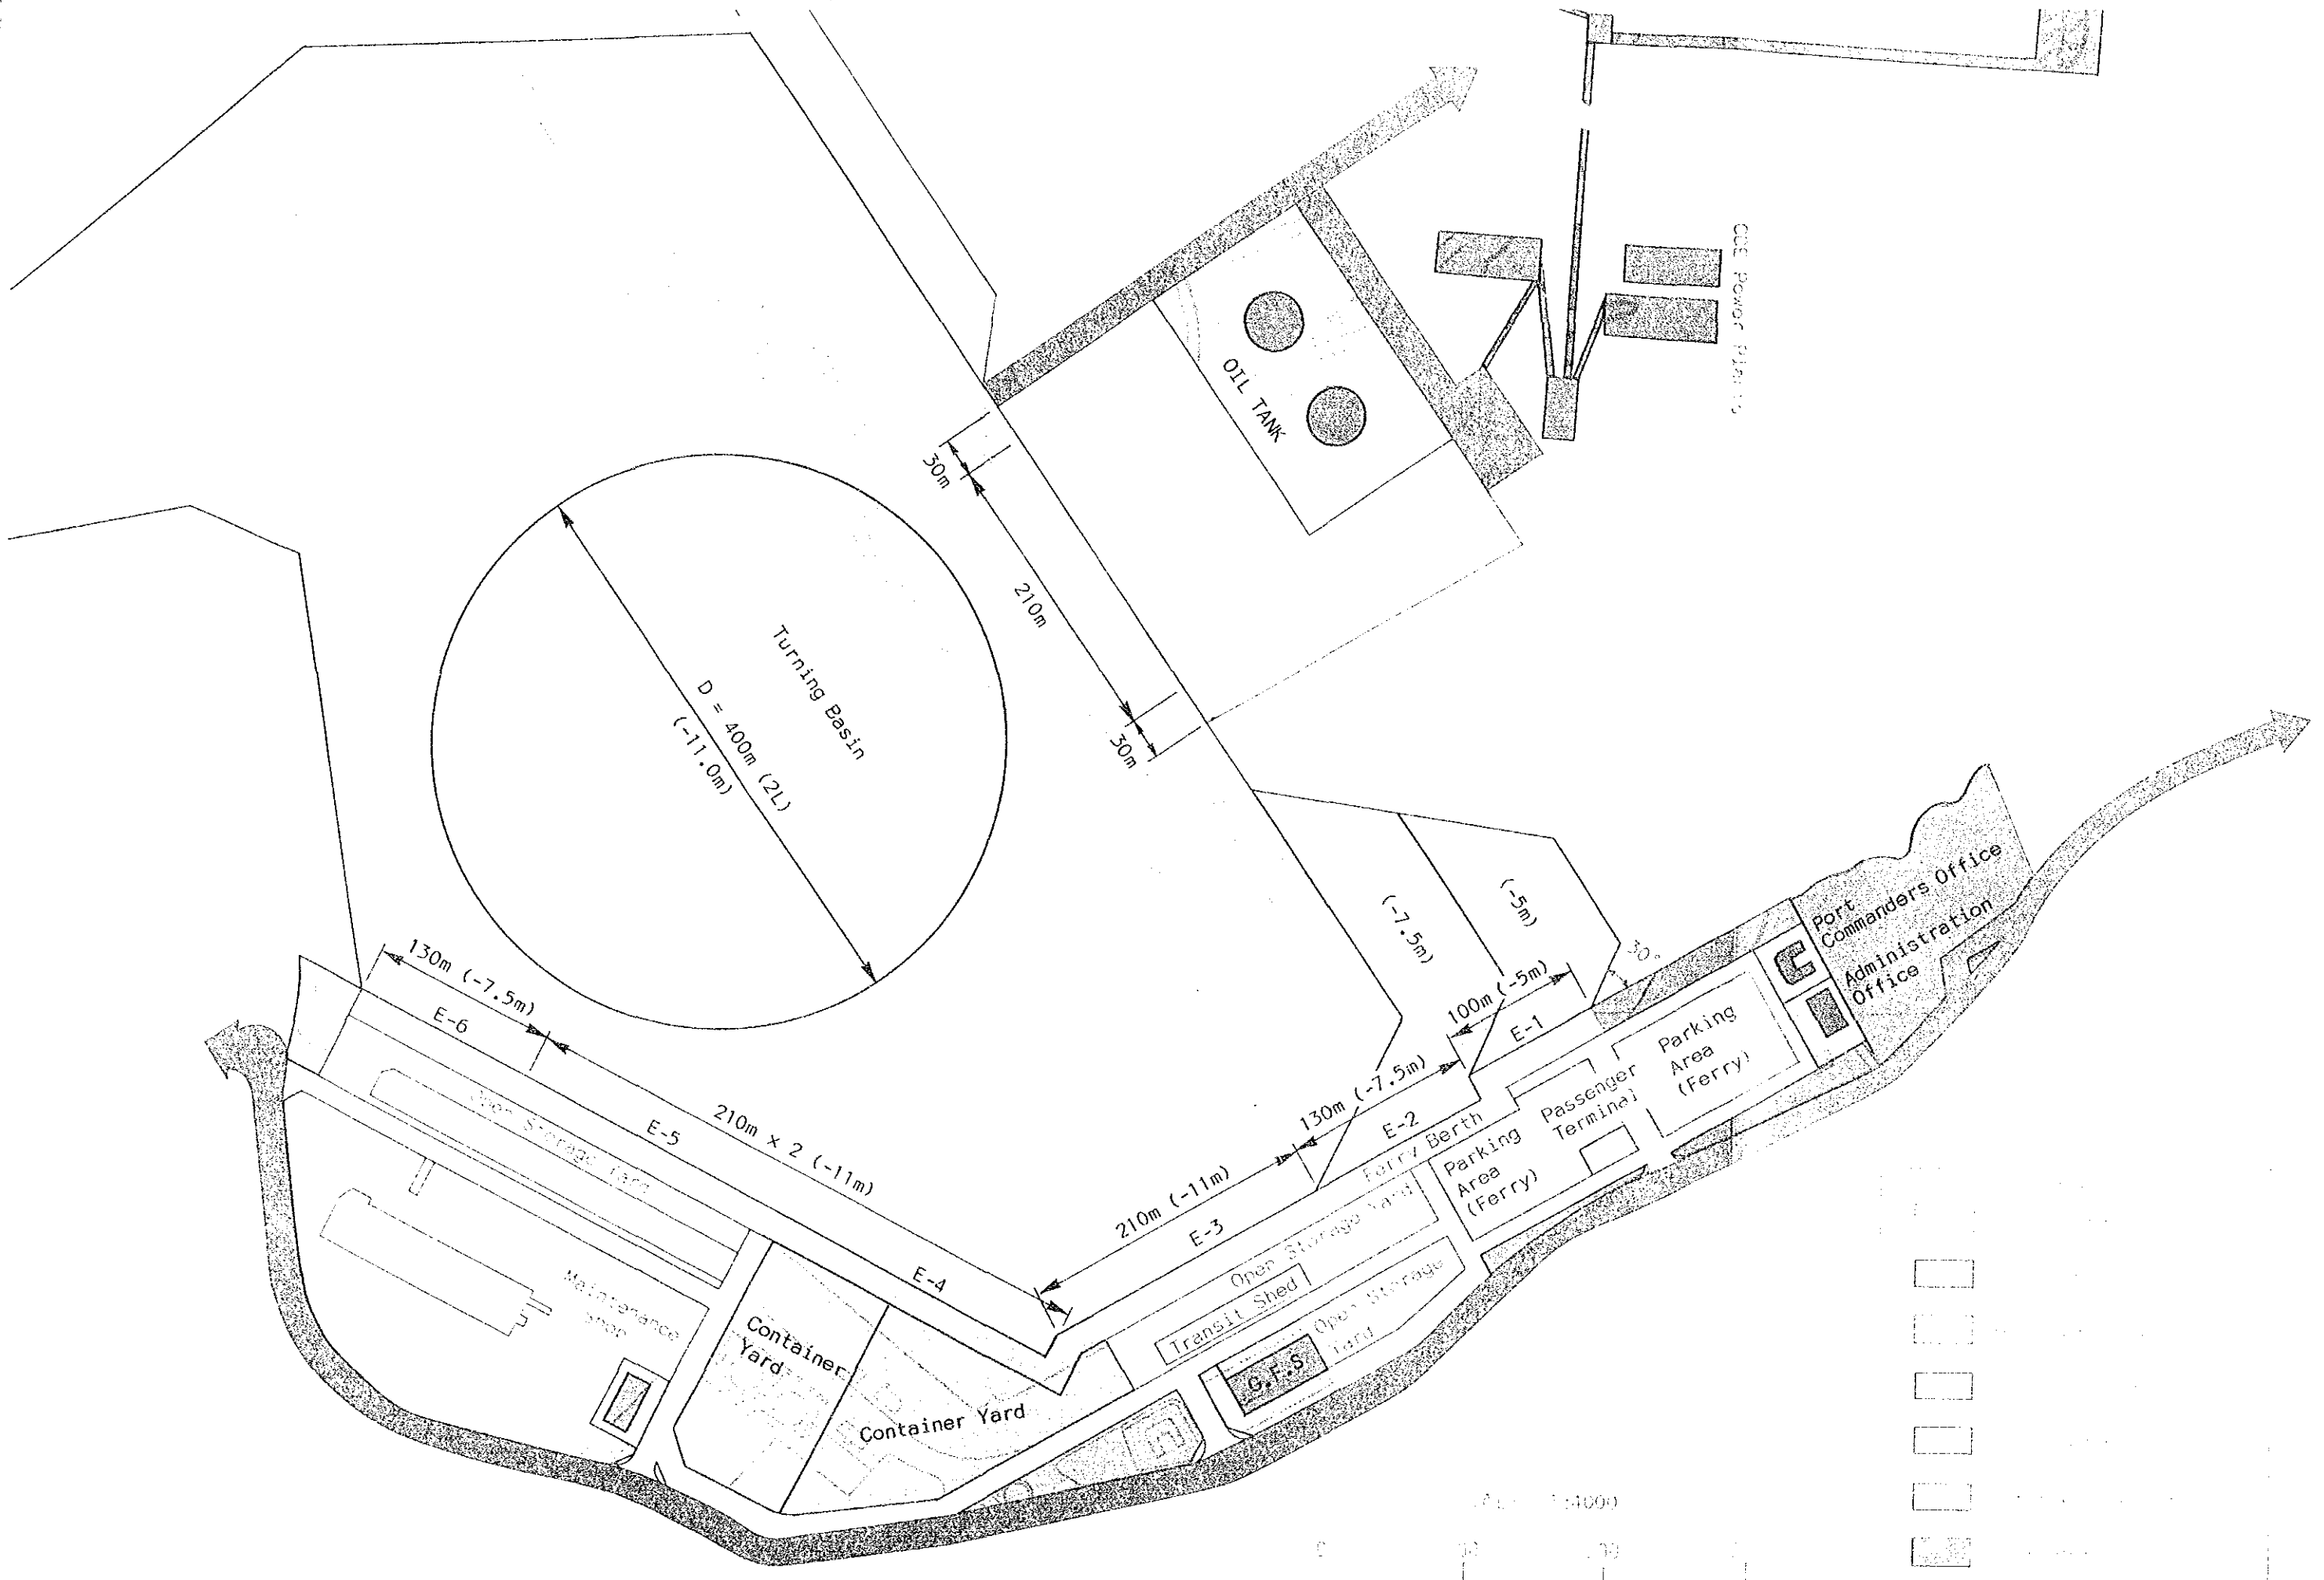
Layout of Port Facilities for the Master Plan
